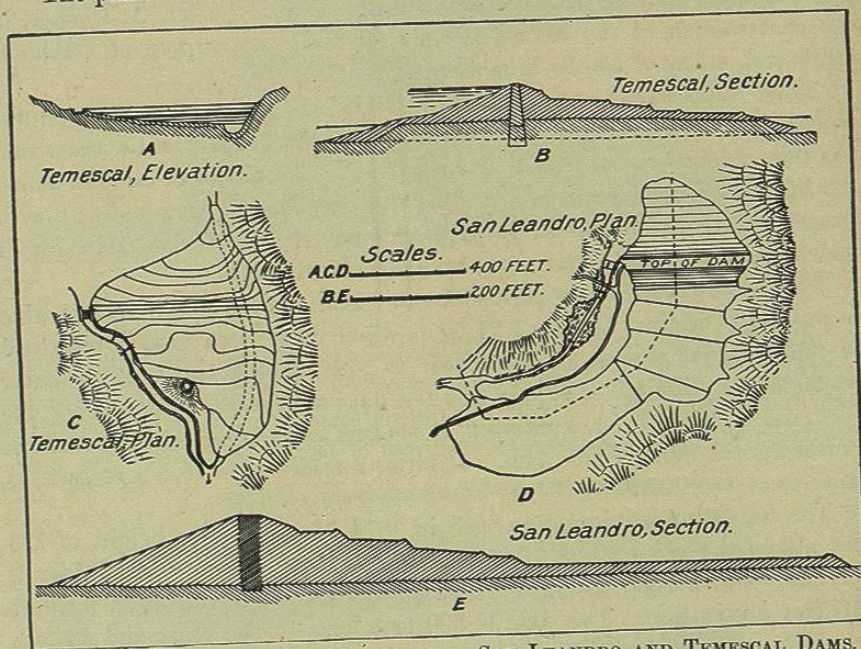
PLANS AND CROSS-SECTIONS OF SAN LEANDRO AND TEMESCAL DAMS.
